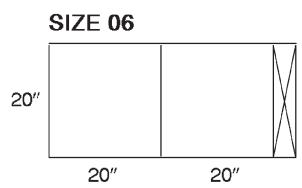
Filter Arrangement, 2-in. and 4-in. Flat
